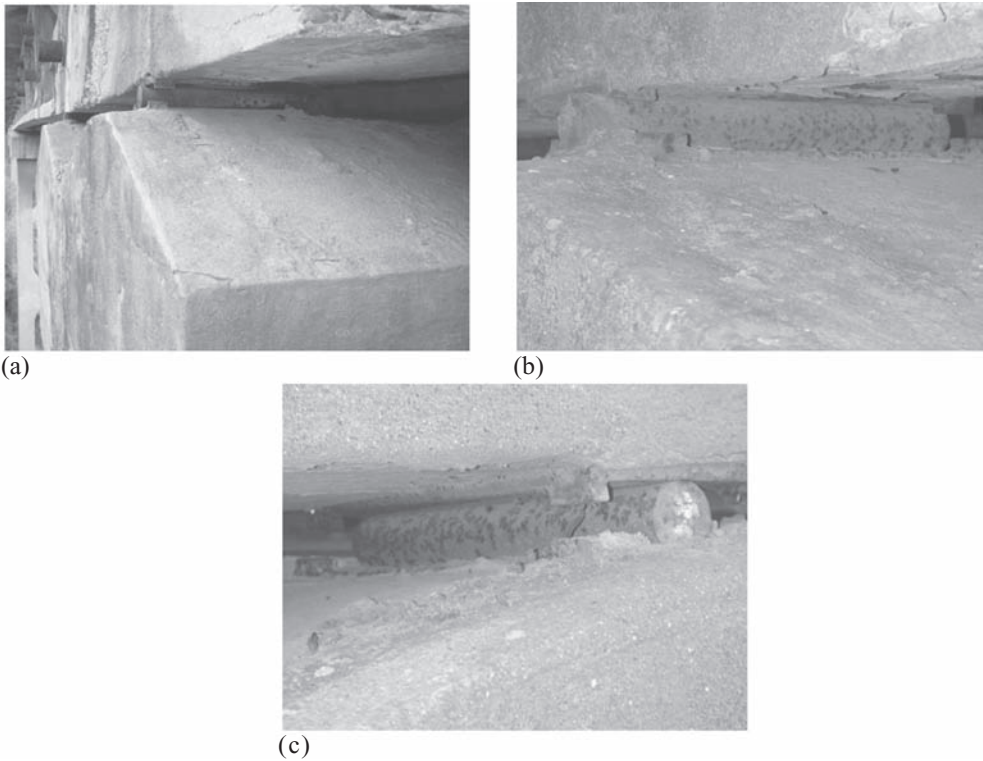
(a) Sliding bearings; (b) Steel rollers between two steel plates; (c) Derailed rollers after earthquake.
